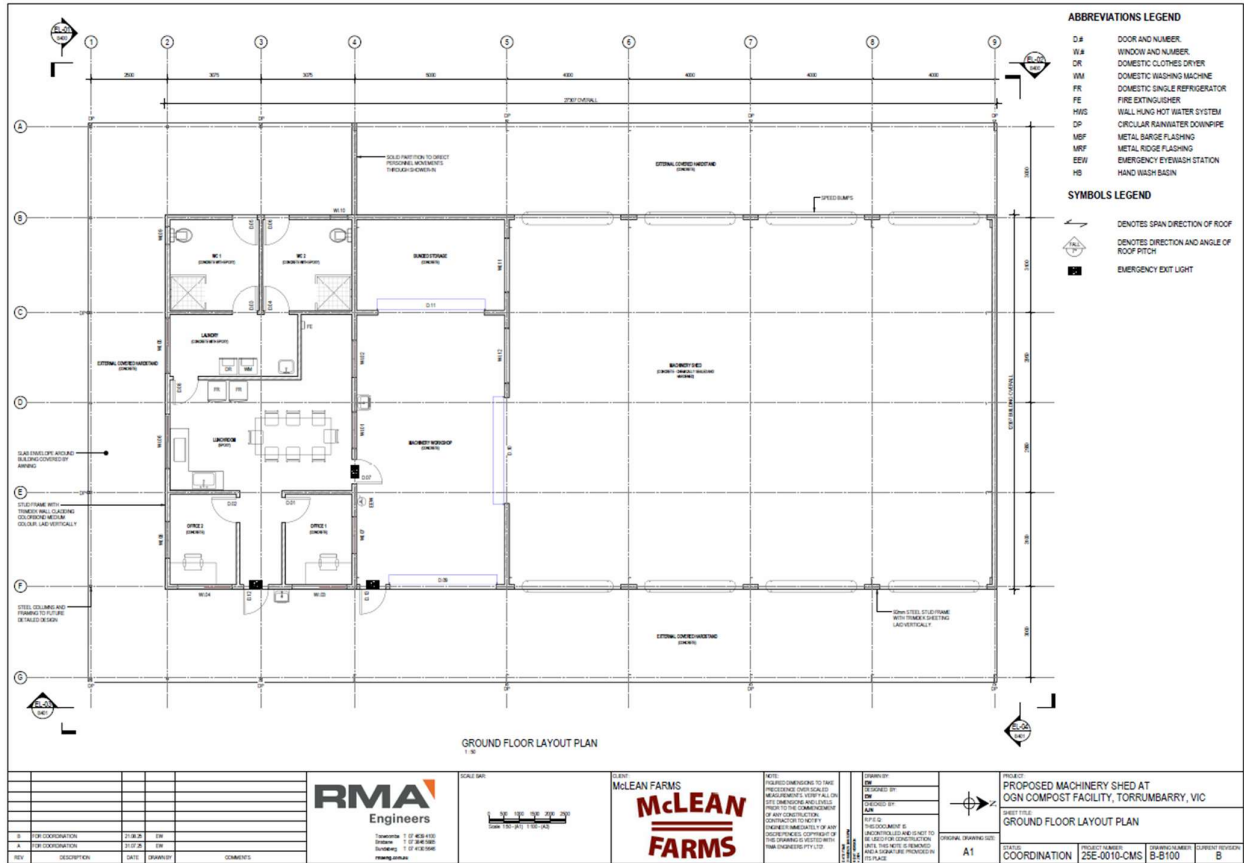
Maintenance Shed Floor Plan (RMA Engineers, 2025)
